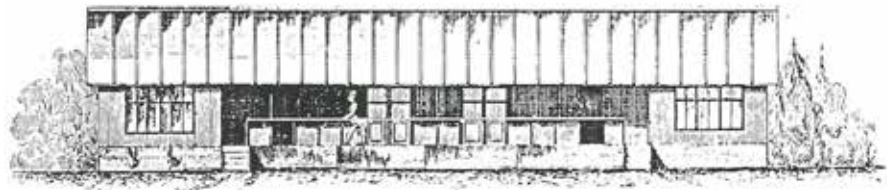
House for hot countries, made out of cardboard elements, Adt, 1867
